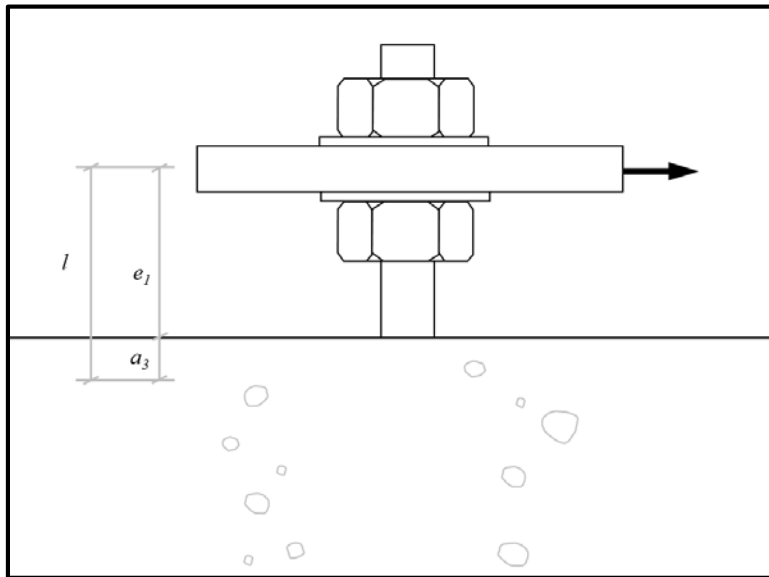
Dimensions used in Eligehausen et al. (2006b) for anchor bolt bending stresses
